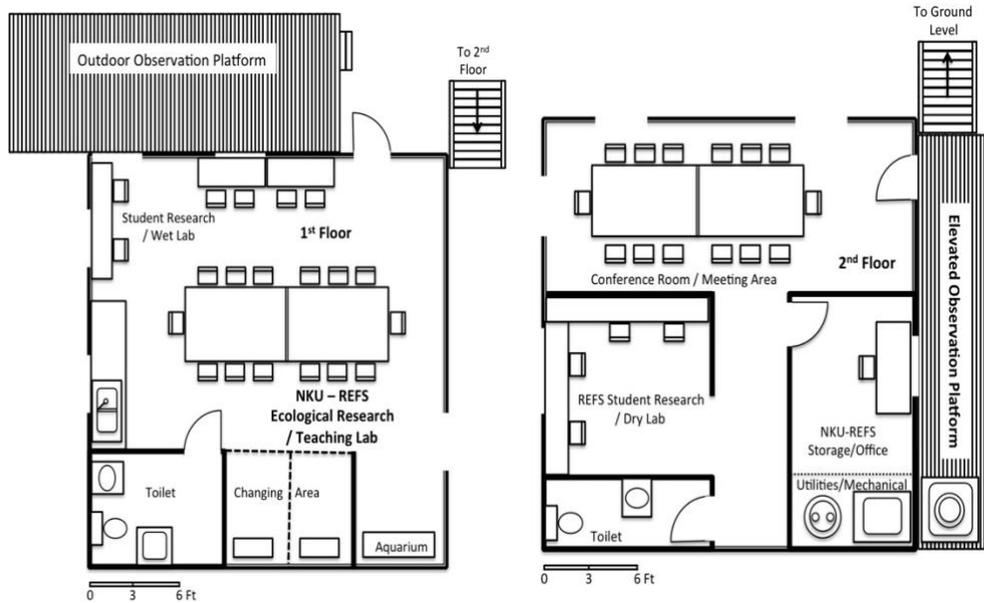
Floor plans of both the first floor and second floor of the facility at REFS. The first floor is set up as a wet lab for research and has a main teaching section. Outside the first floor is a large observation platform. The second floor has a dry lab and student research space. It also has an office and a main conference area. There is a small elevated observation platform off the main entrance.
